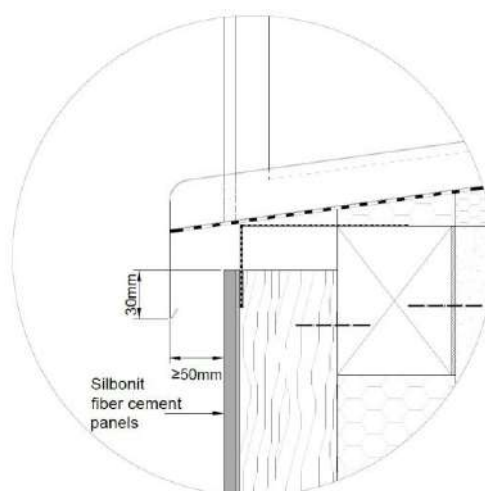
Example of vertical section of a detail of the cladding beneath a window.
